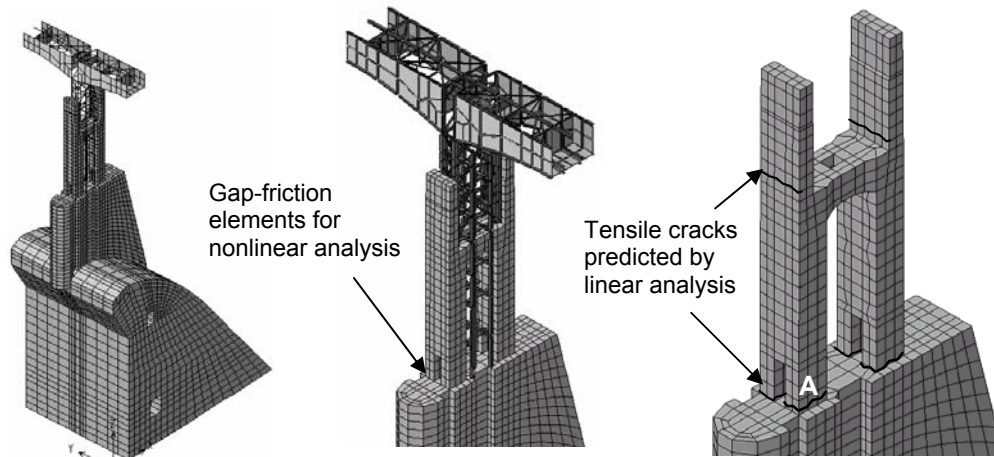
FE Model of Spillway Monolith with Close up Views of Tower and bridge
